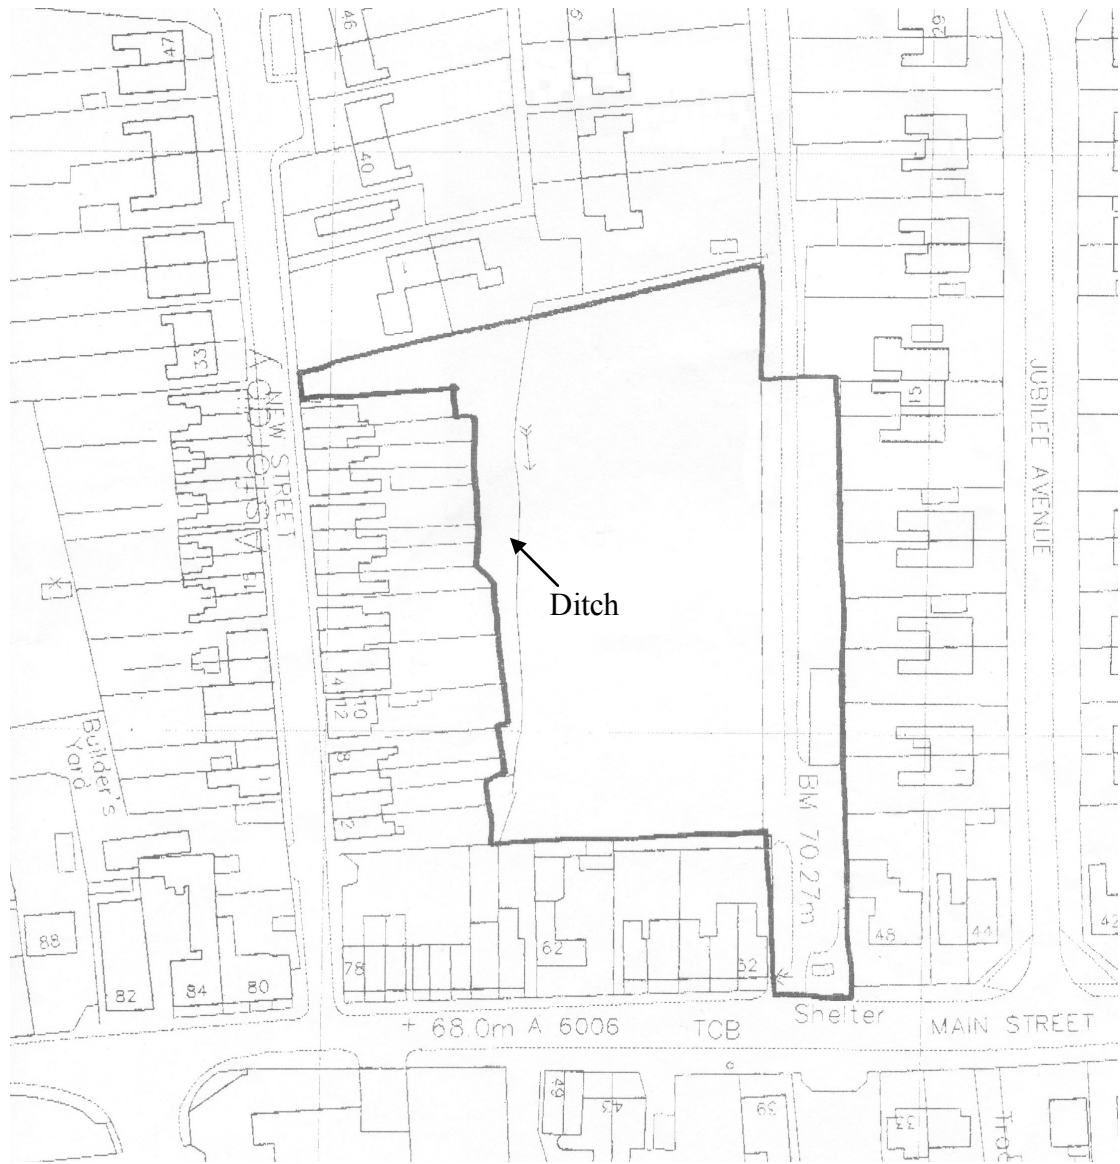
Plan of the site area. Plan supplied by client. Not to scale.
